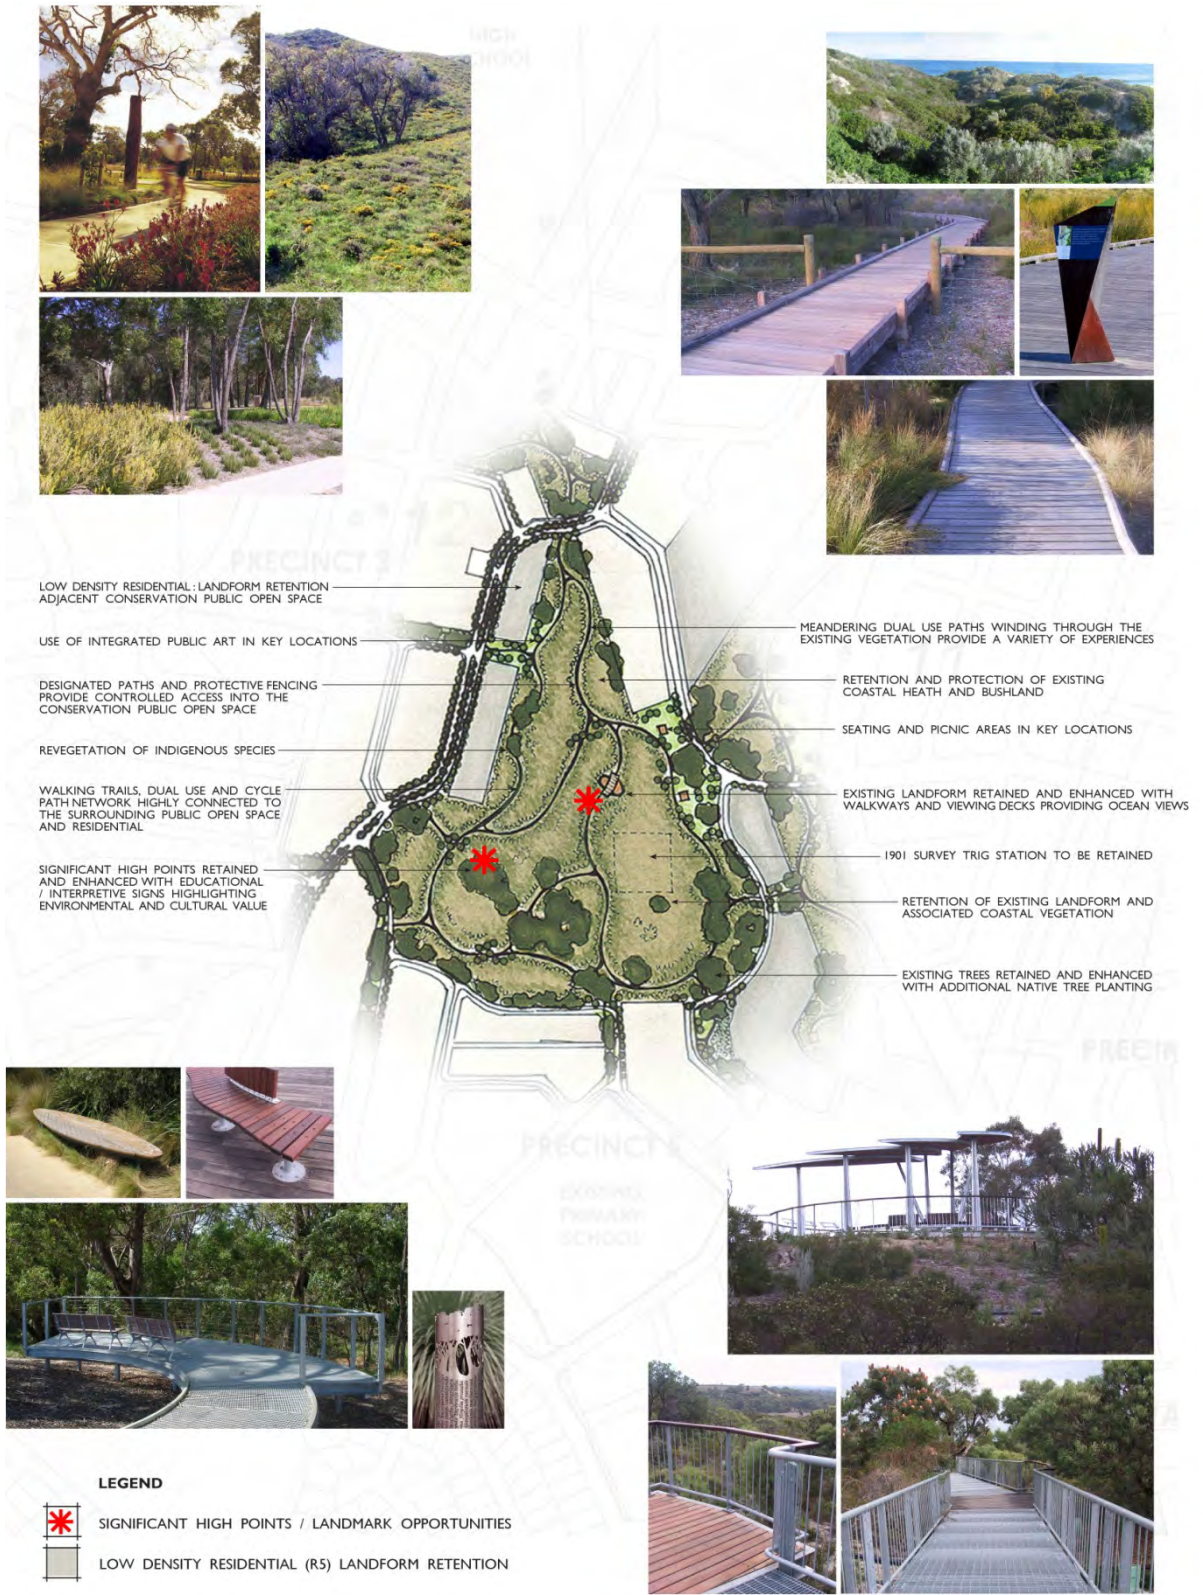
PASSIVE OPEN SPACE [SOURCE: PLAN E]
